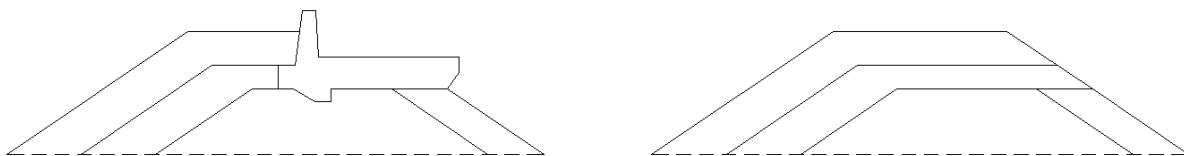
Crest of structure with crown wall (left) and without crown wall (right)
